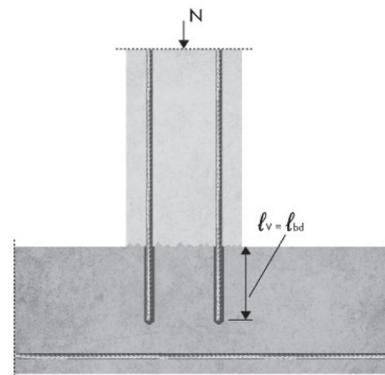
Rebar connection of components stressed primarily in compression. The rebars are stressed in compression
